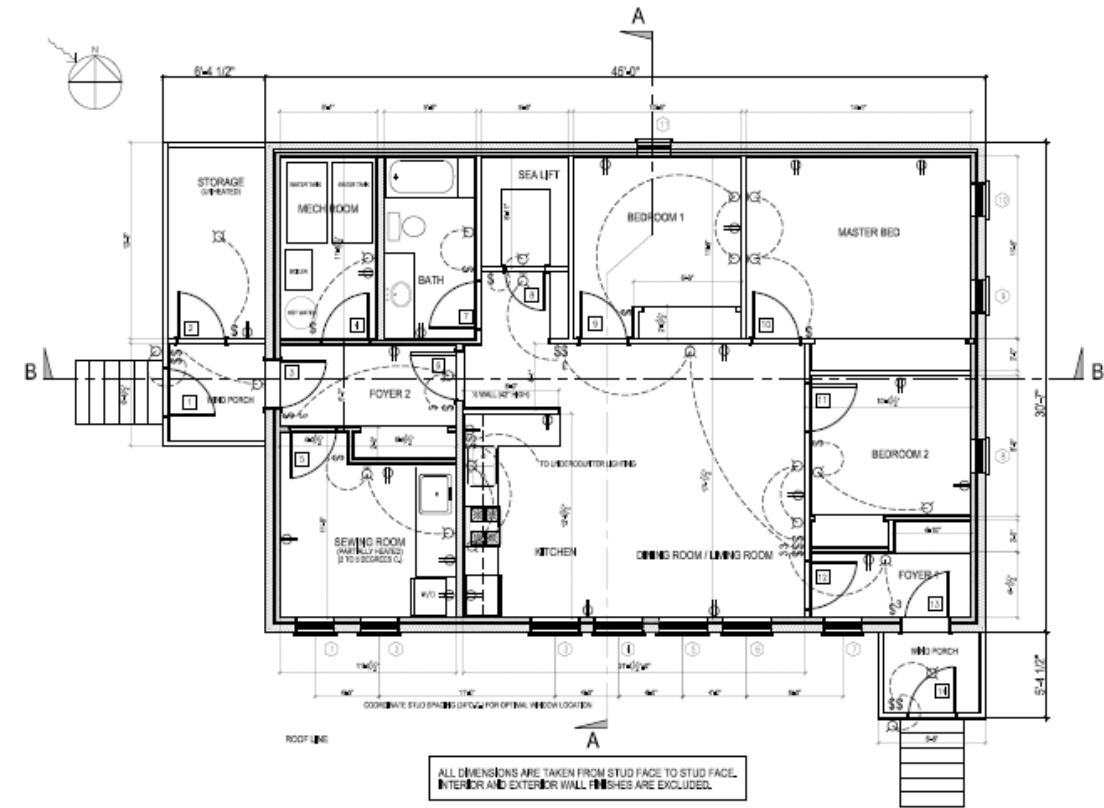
Floor Plan of the Arviat Northern Sustainable House (Semple, 2007)
